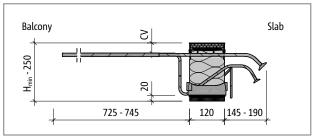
Schöck Isokorb® XT type K-O-M4: Product section
